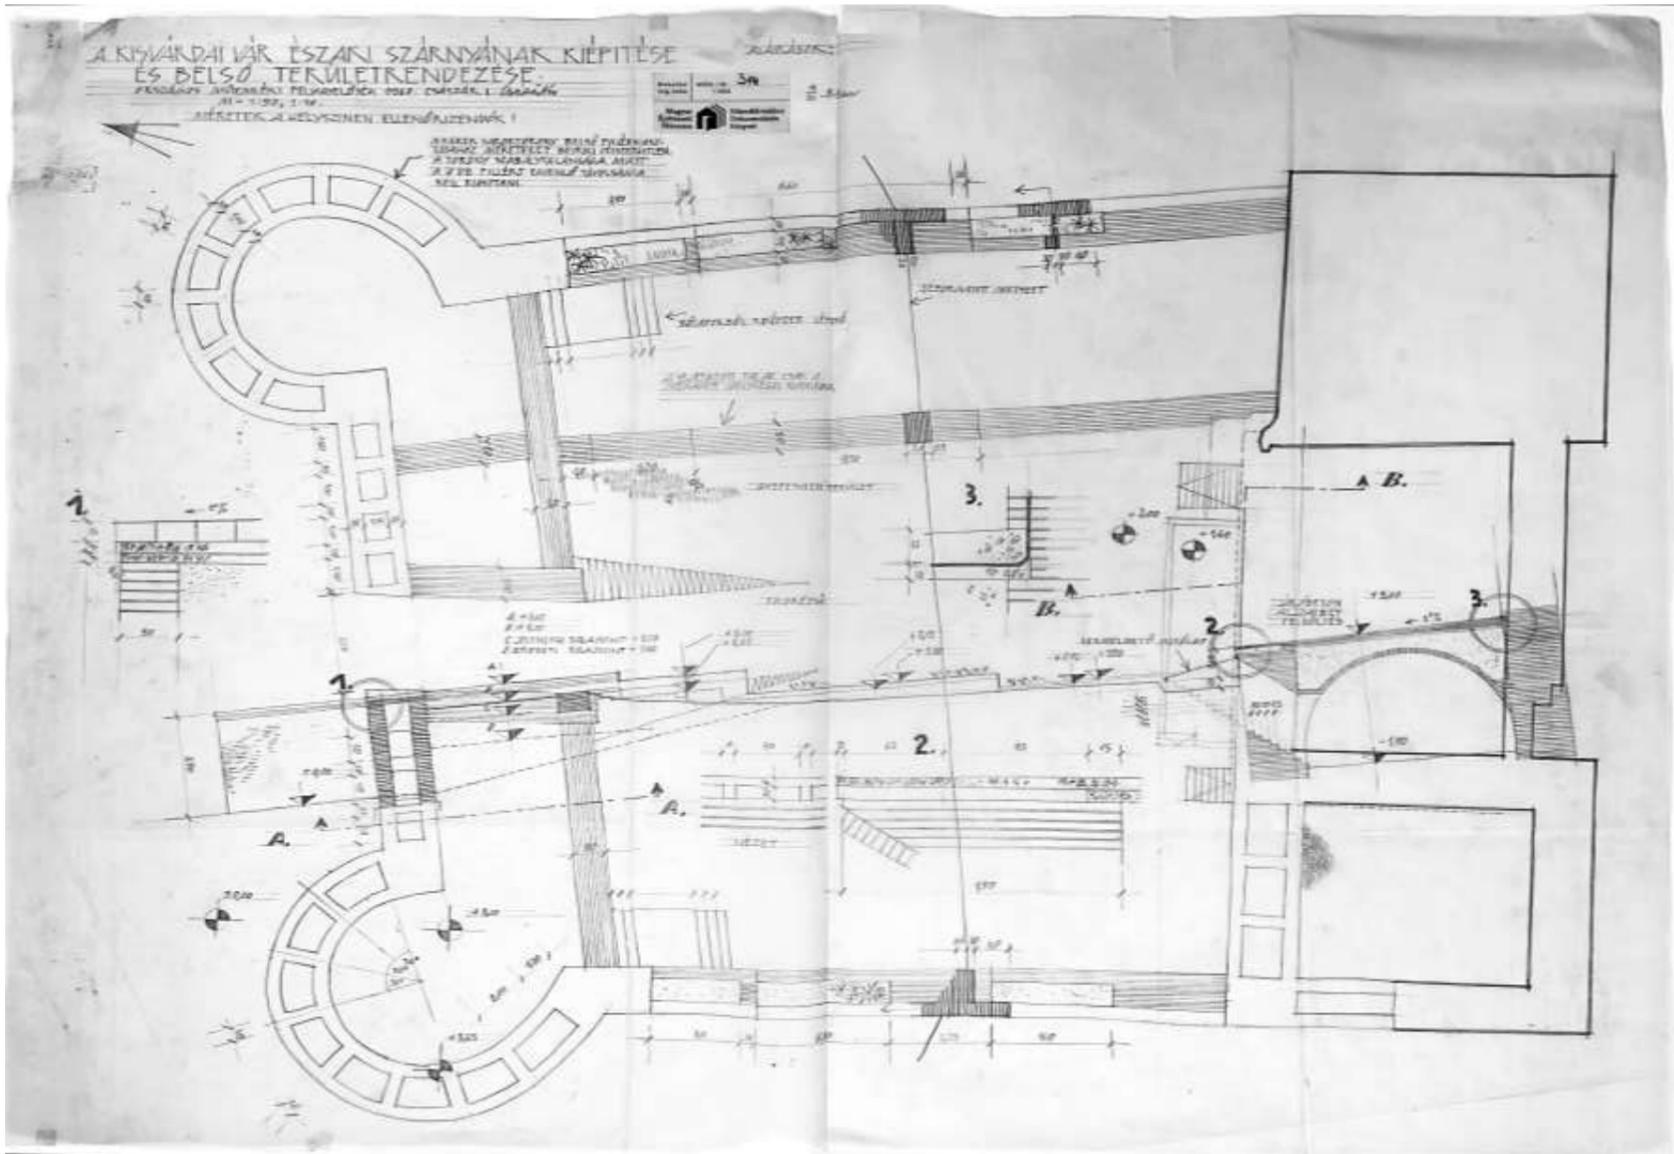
Ground plan of László Császár from 1960. (MÉM MDK Architecture Plan Collection, 63/12461)
